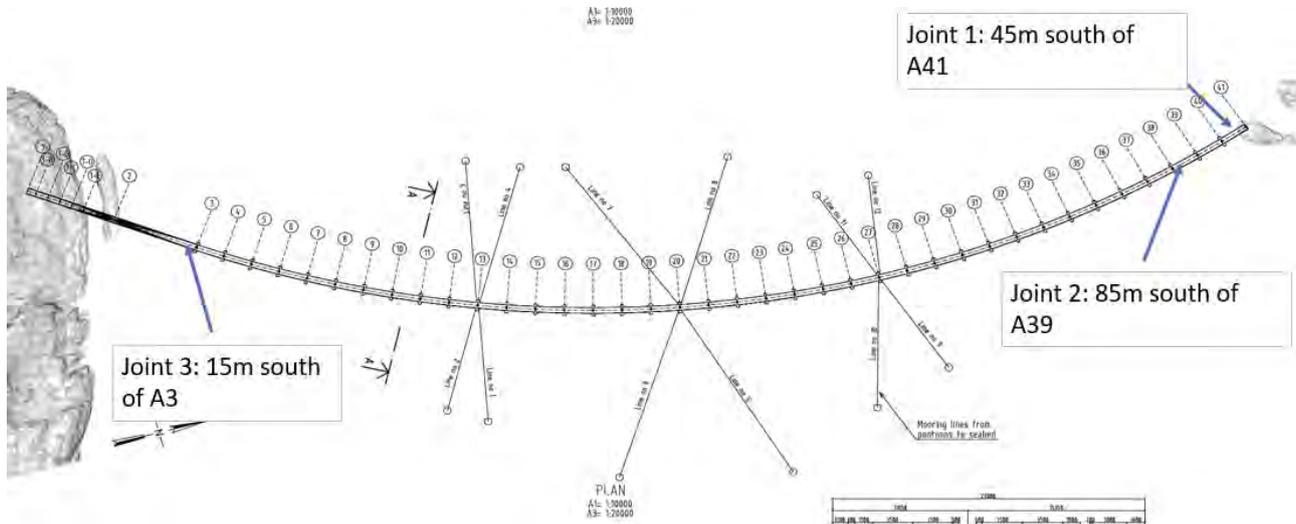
Construction joints within deck box girder - 2 at north bridge end and 1 at south bridge end towards the cable stayed bridge
